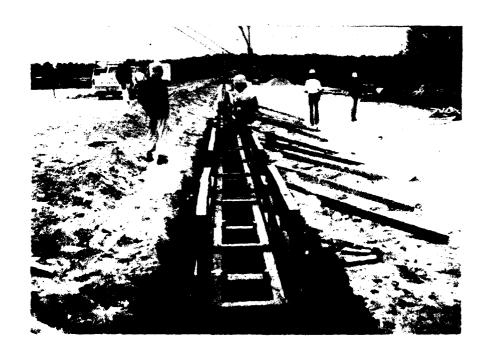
Forming guidewall at station 1+00 to 1+65 (November 9, 1983)
